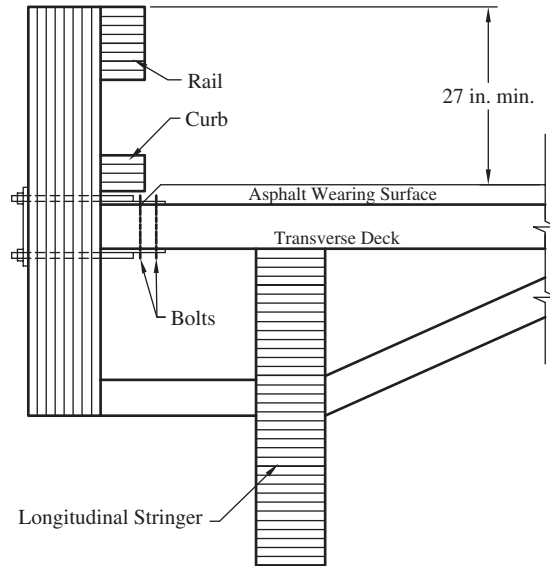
Typical rail and curb system for a transverse deck timber highway bridge.
